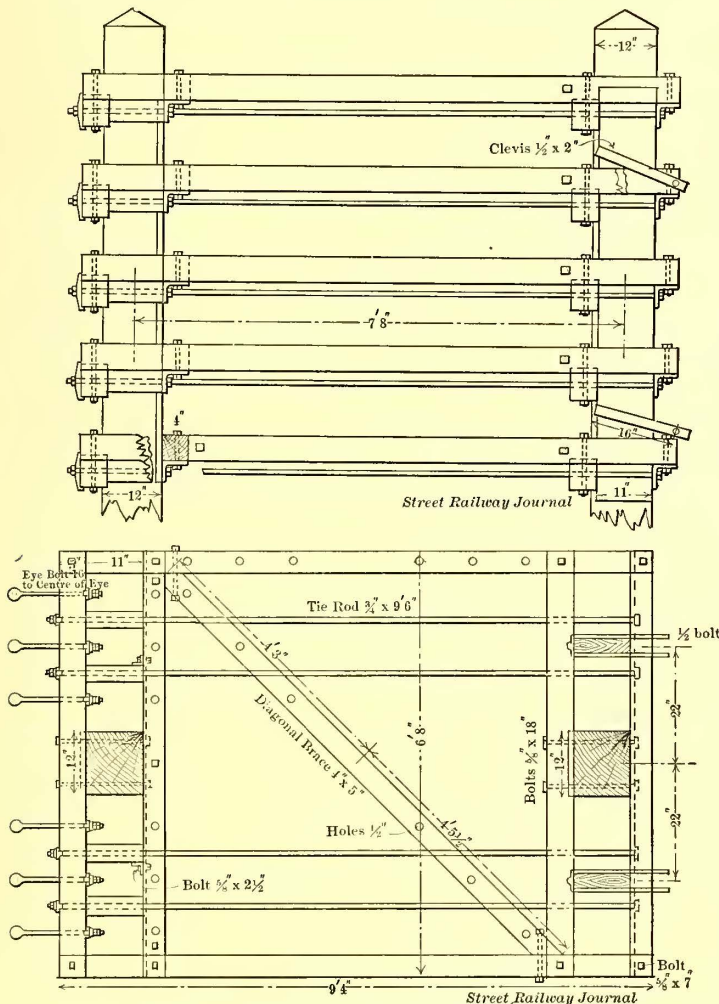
PLAN AND SIDE ELEVATION, TERMINAL POLE.—NEW ORLEANS.
